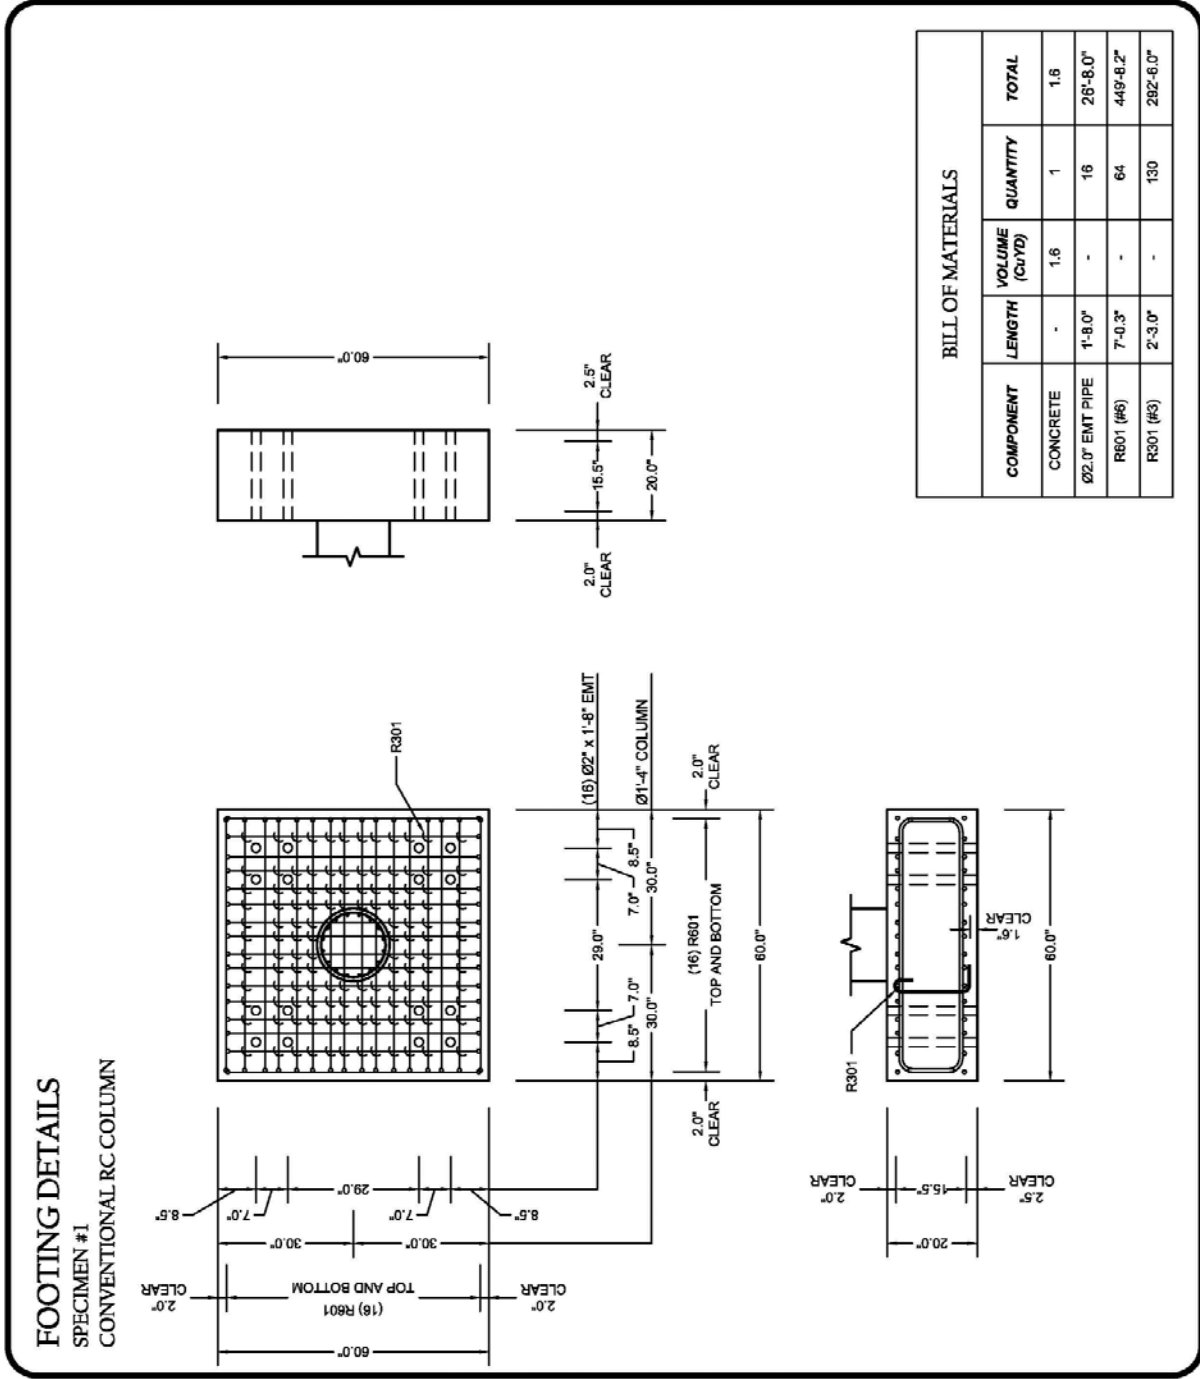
Reinforcement for column load stubs and footings (cont.).
